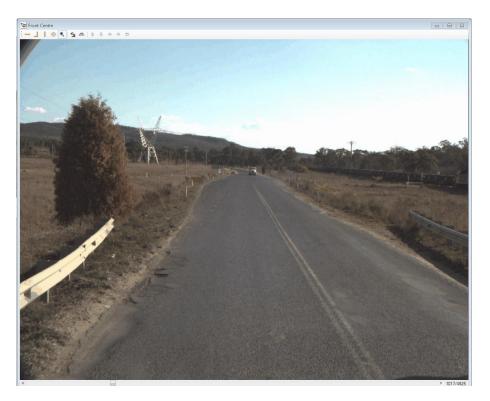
Ulan/Cope Road intersection (southbound approach)
